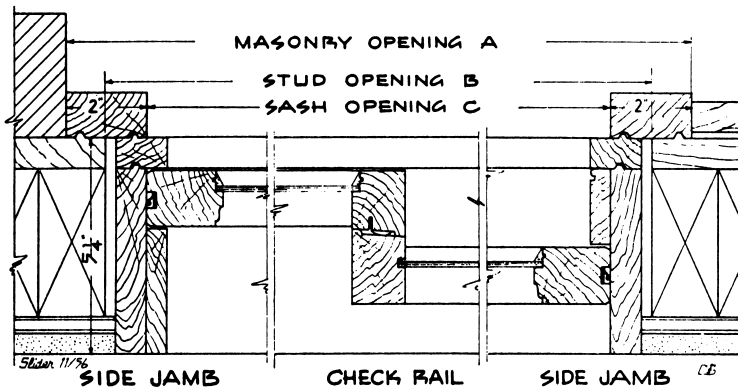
Detailed drawing of windows in masonry and frame construction.
